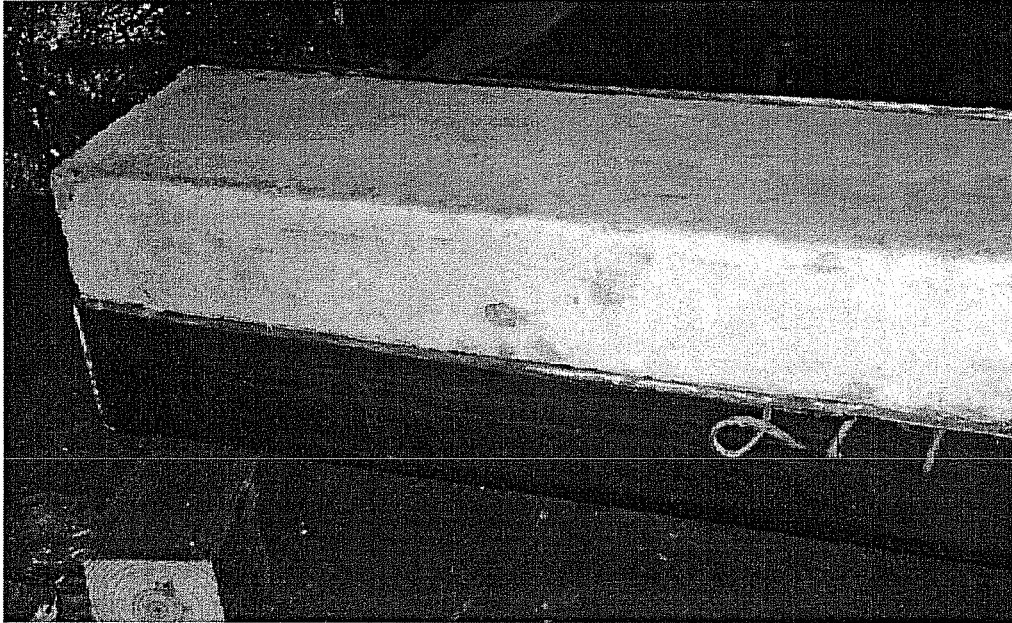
The concrete core of a specimen after removal of one side of the steel tube.
